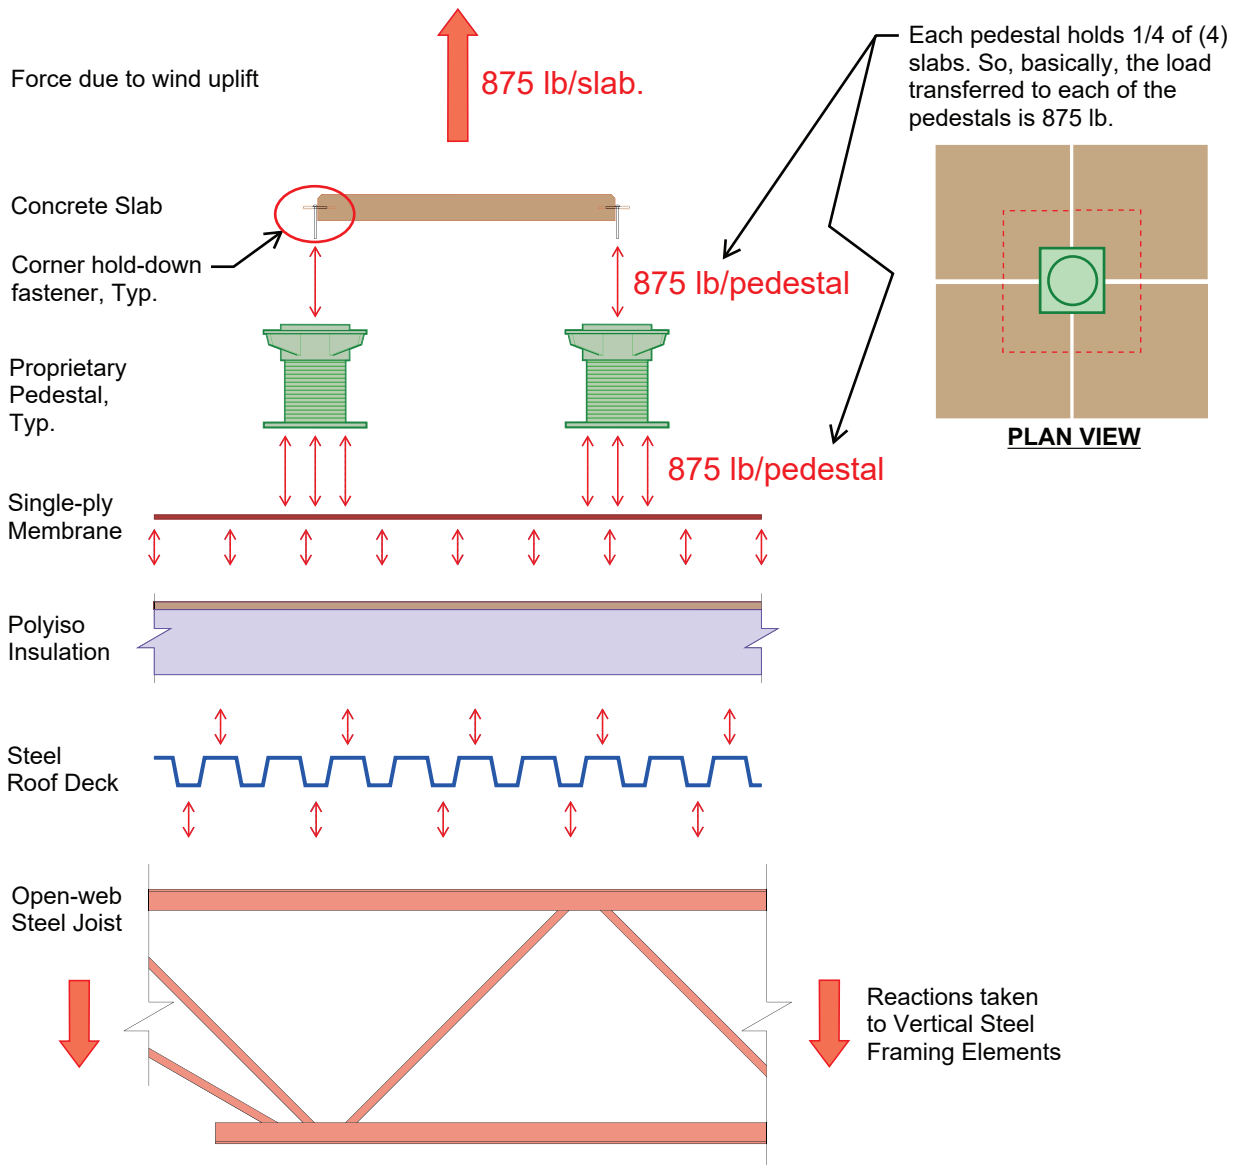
Free-body Diagram of Segmental Concrete Paving Slab System, Roofing System, and Roof Framing
